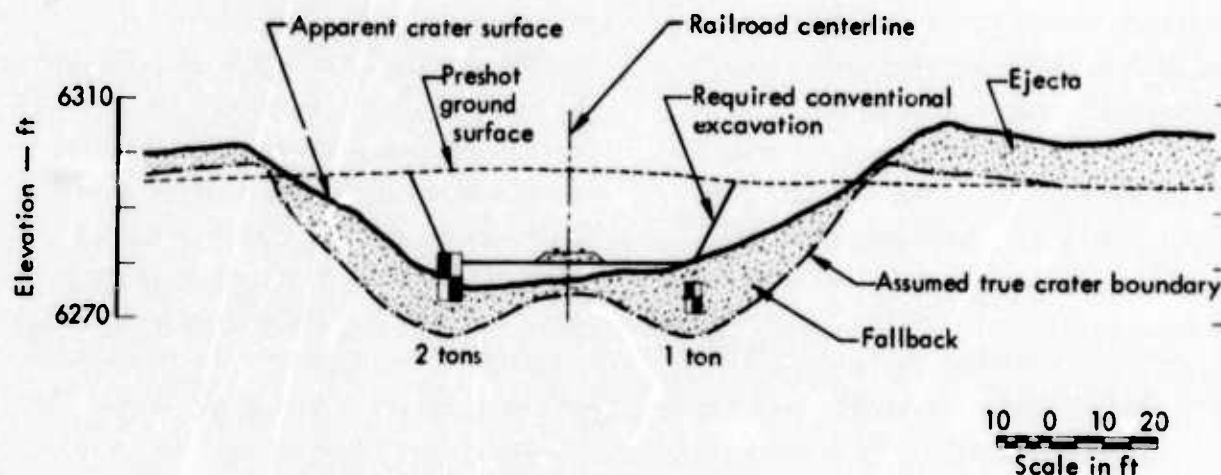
Typical cross section of Project Trinidad railway cut (at Station 94+60).¹
